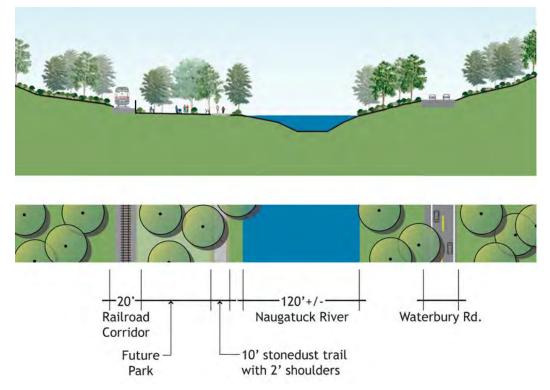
Trail cross-section south of Frost Bridge Road (Route 262) and potential new park space along the west bank of the Naugatuck River.
